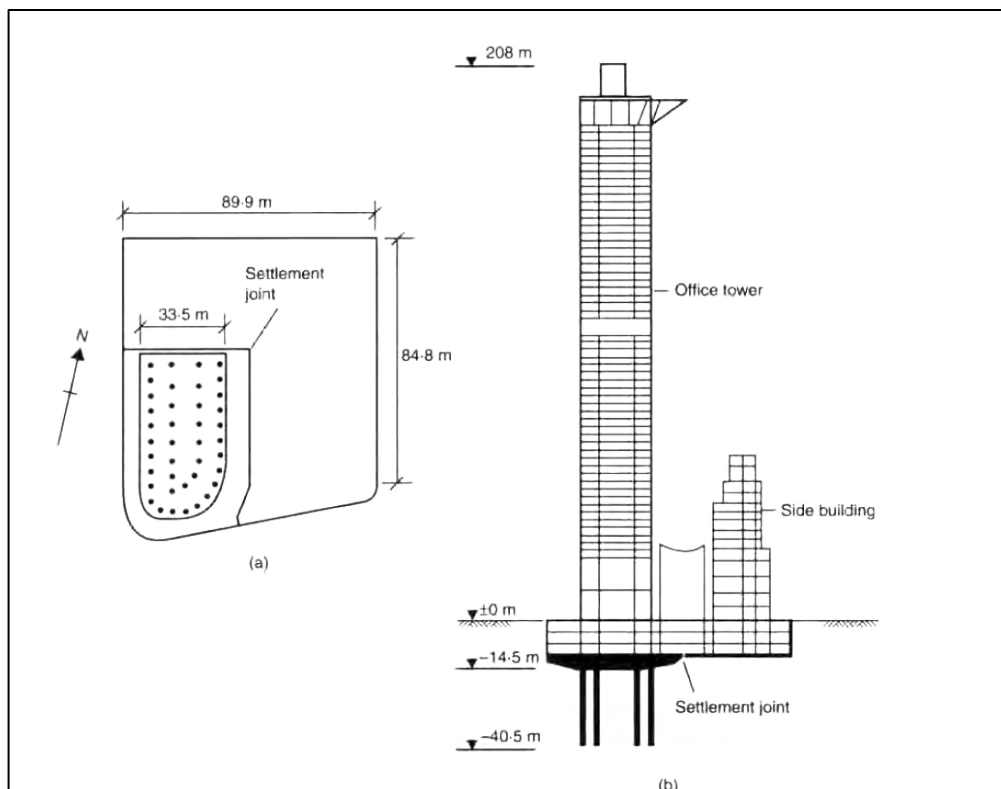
Plan (a) and elevation (b) view of Westend Tower Building (Katzenbach et al., 2000)
